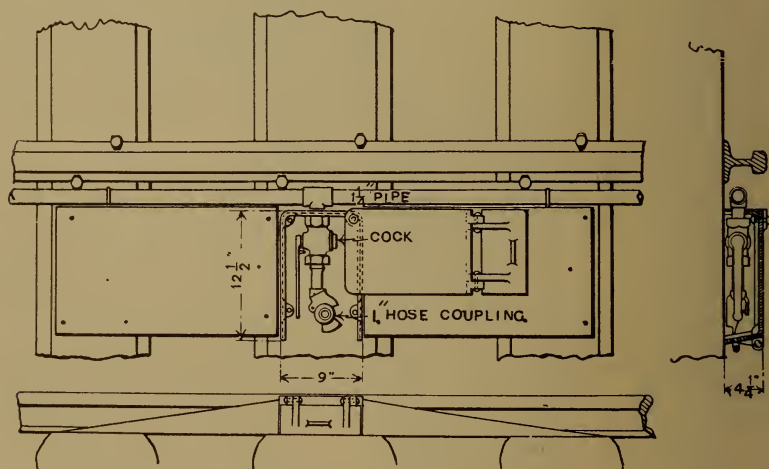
ARRANGEMENT OF AIR PIPE FOR TESTING AIR BRAKES.
